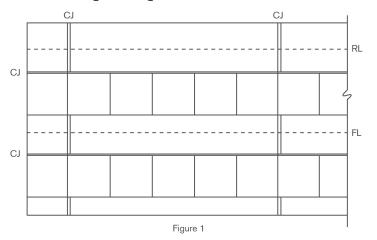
illustrates a two story commercial building with continuous or strip windows. Normally for this type of construction, the brickwork over the windows is supported by shelf angles going from column to column. These shelf angles are good places to locate the horizontal CJ's in the veneer. Since the veneer is separated horizontally by continuous angles, the vertical control joints can be placed anywhere along the length of the wall. It is best to place CJ's at least at the columns and then, if desired, in between the columns. Figure 1 shows one possible arrangement for the control joints.
